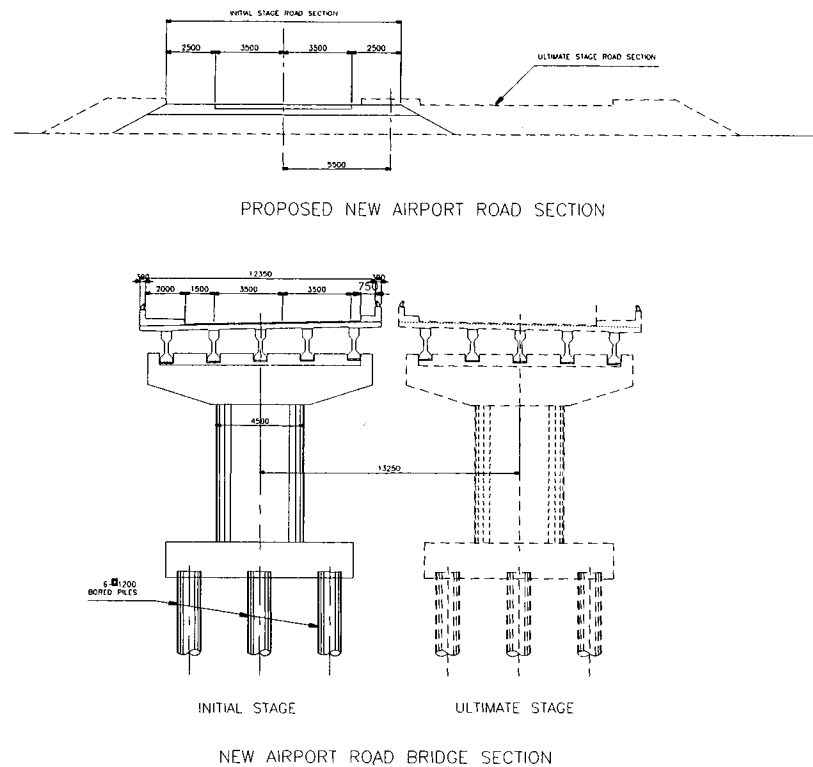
TYPICAL NEW AIRPORT ROAD BRIDGE SECTION
